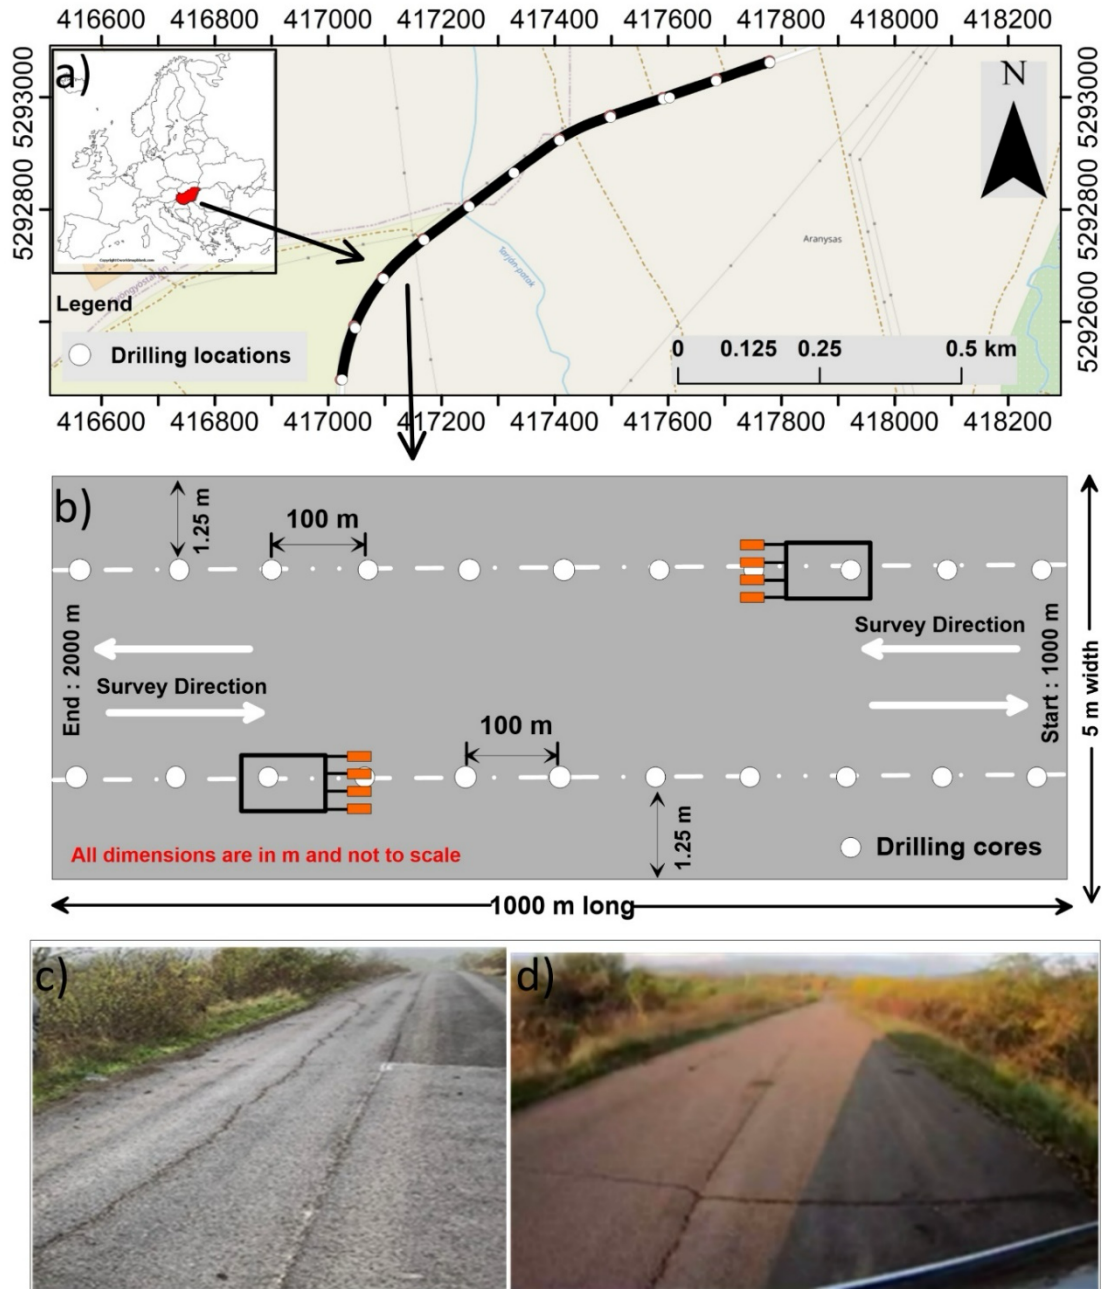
a) The location of the test site b) location of the survey lines and drillings, c) and d) photos of the road showing two types of cracks (longitudinal and transverse)
